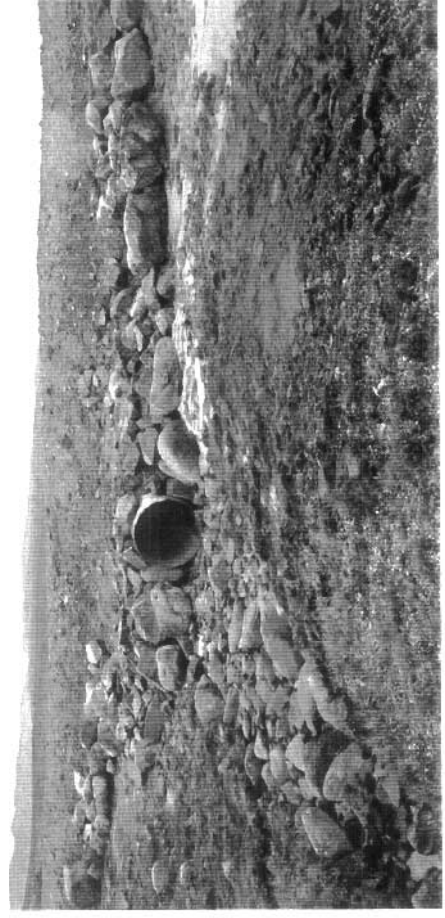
Km 18 Culvert, 7 August 2002. Stream channel at upstream end of culvert. Note: rip-rap placement to protect the road slope.
